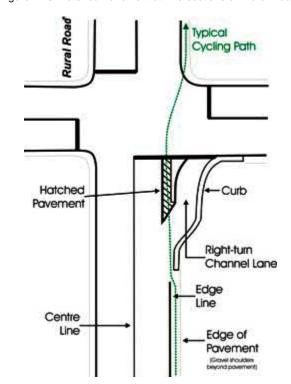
Hatched Pavement at Intersections on Rural Roads
